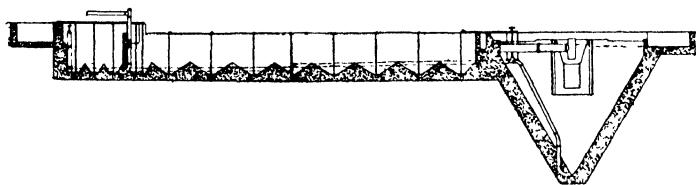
SECTION OF ACTIVATED SLUDGE PLANT.
